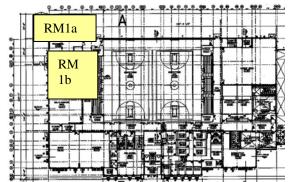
Rec Center 1st Floor Mechanical Room Locations
